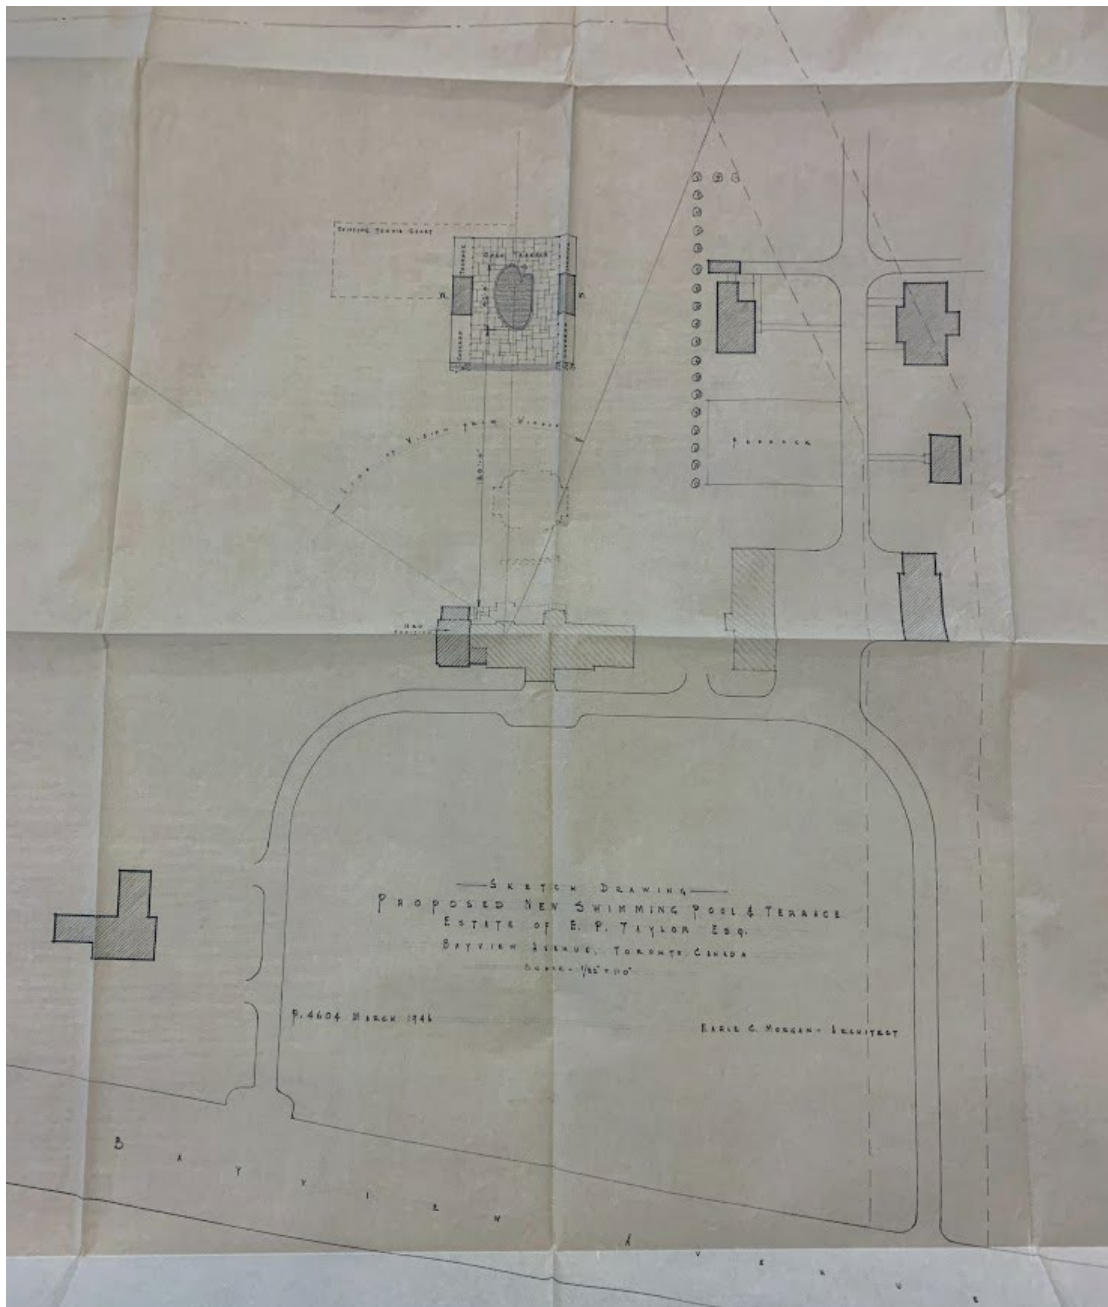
1946 Site Plan sketch by Morgan for Windfields. The lightly-shaded Main House and Stables were already built by Davidson in 1936-1937, while the heavily-shaded buildings are new (Gatehouse, north wing of the Main House, pool and cabanas, the three cottage and the Garage). Note the original location of the tennis courts where the pool is proposed and the intentional view eastward from the rear of the Main House toward the new recreation area. (Archives of Ontario)
